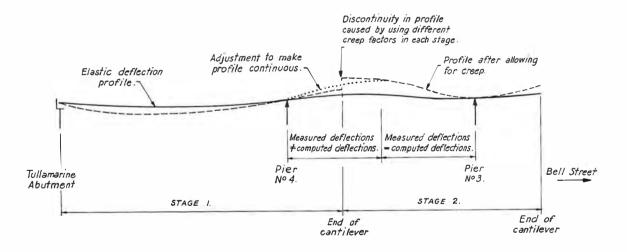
Bell Street Bridge, Method of adjusting deflection profile.
